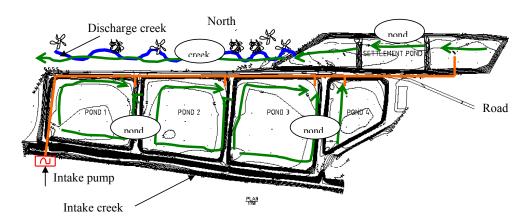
Site Plan of Mudla crab ponds (source Figure 1, Environmental Management Plan. Appendix 3)
